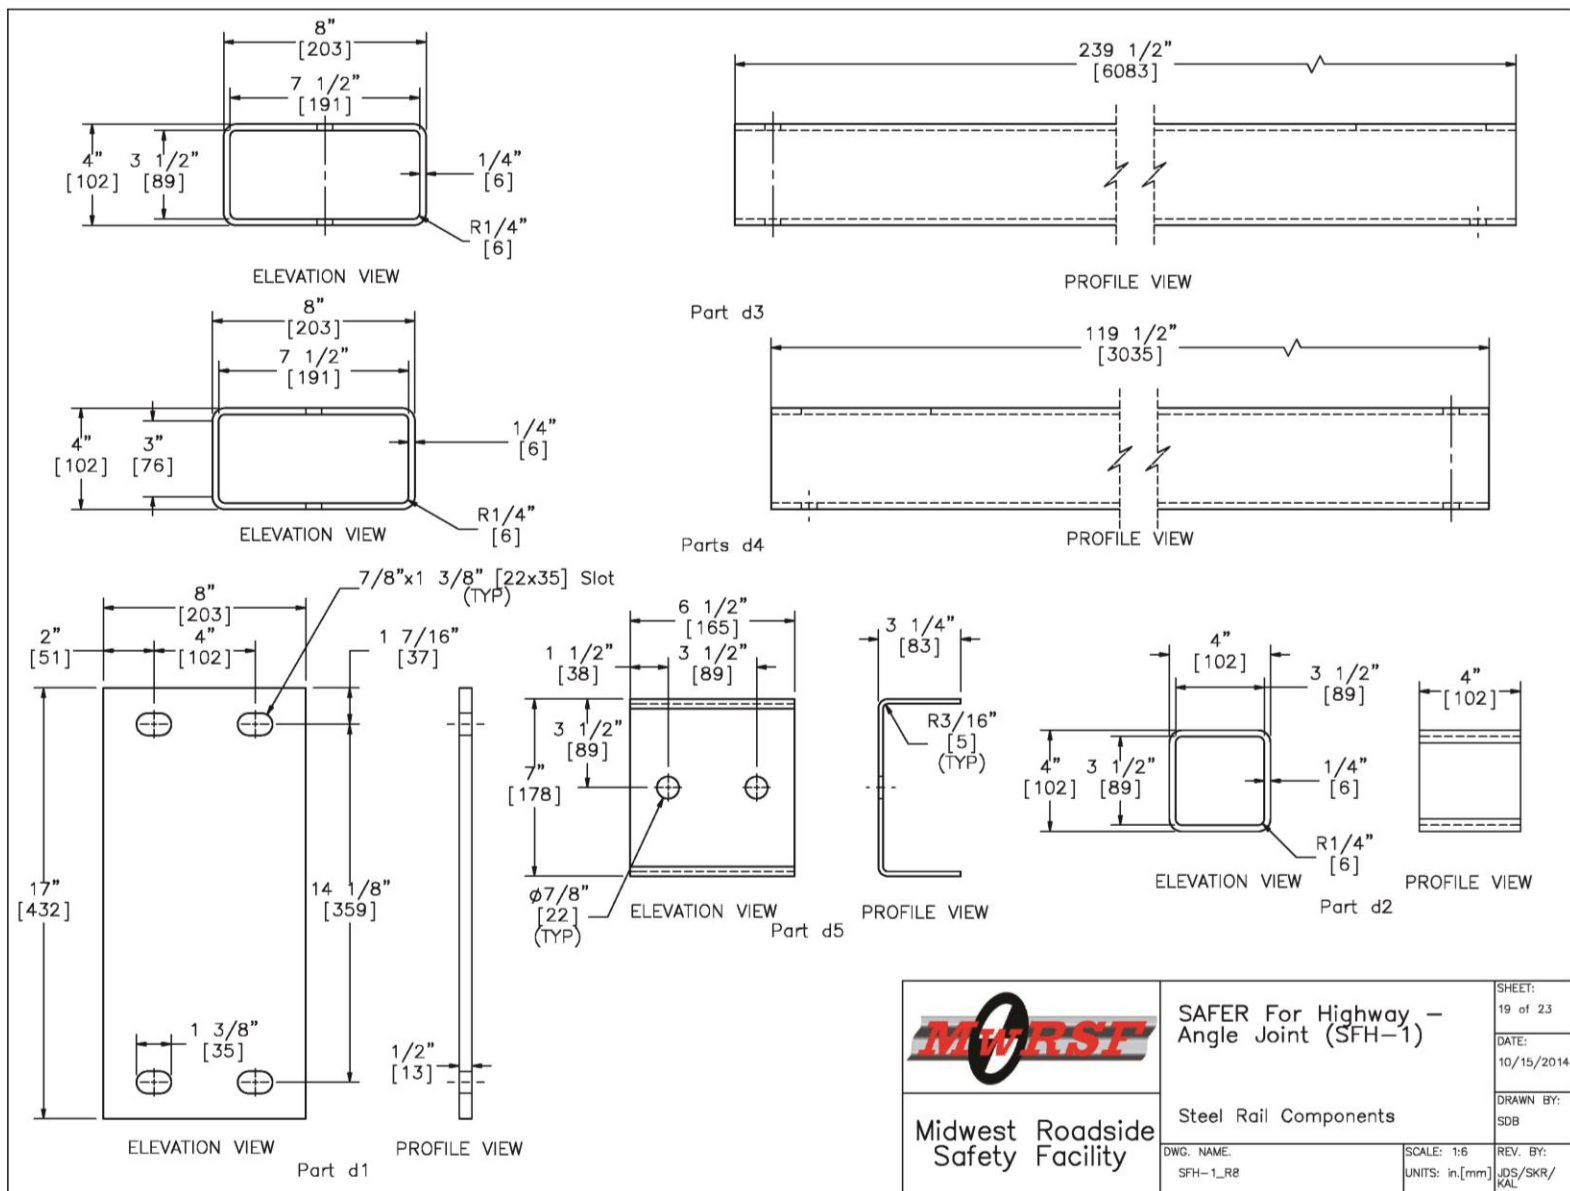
Recommended Barrier Design for Full-Scale Crash Testing, Steel Rail Components
